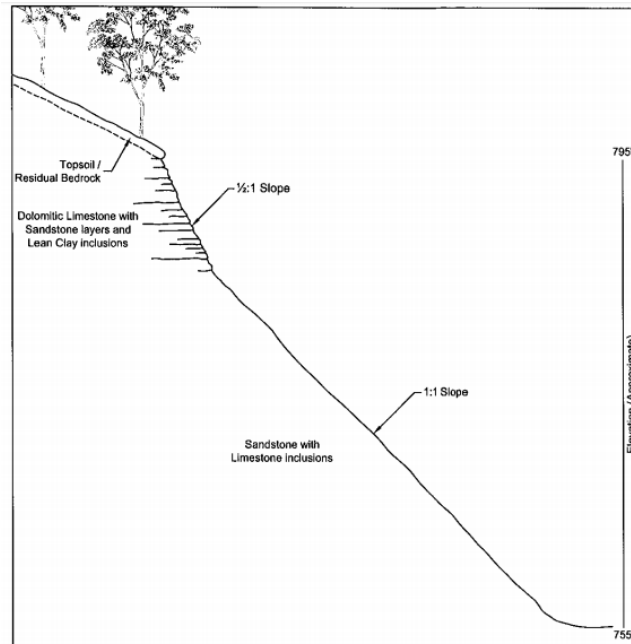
Washington County Site slope profile (from Washington Co. Highway Dept.)
